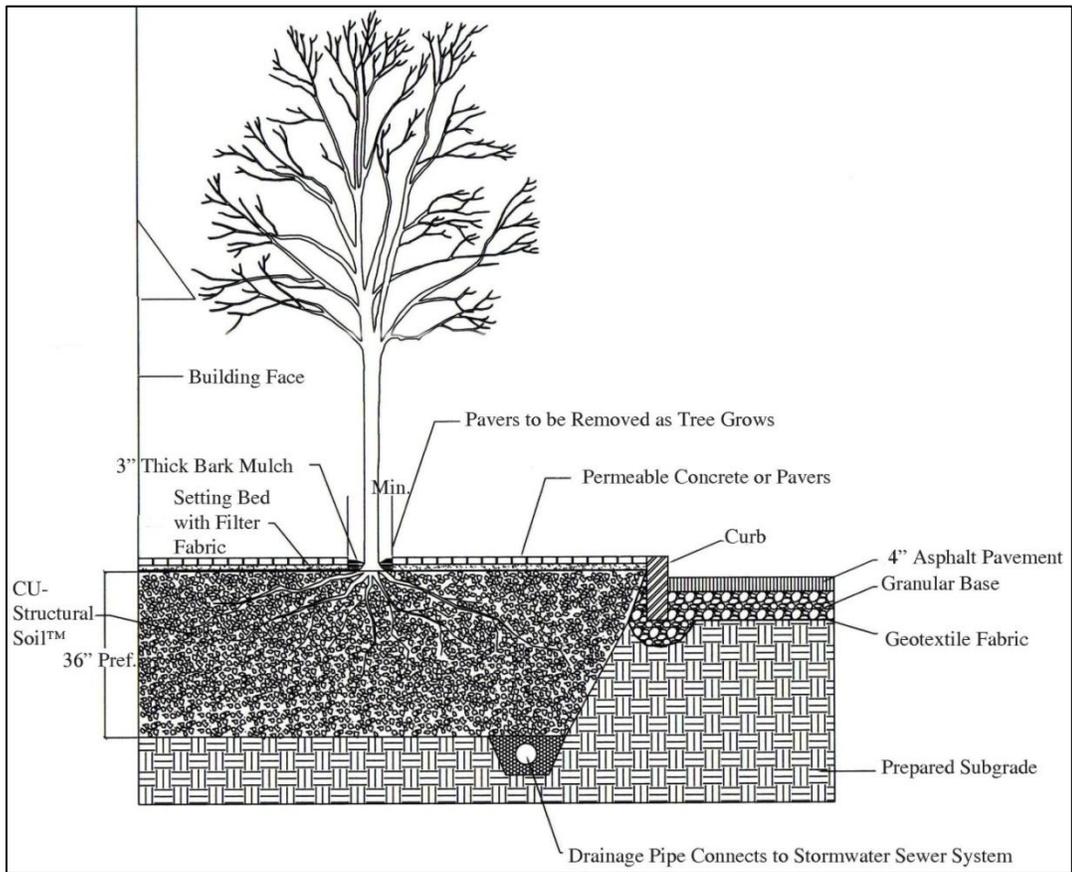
Typical CU-Structural Soil™ application incorporating pervious pavement.
